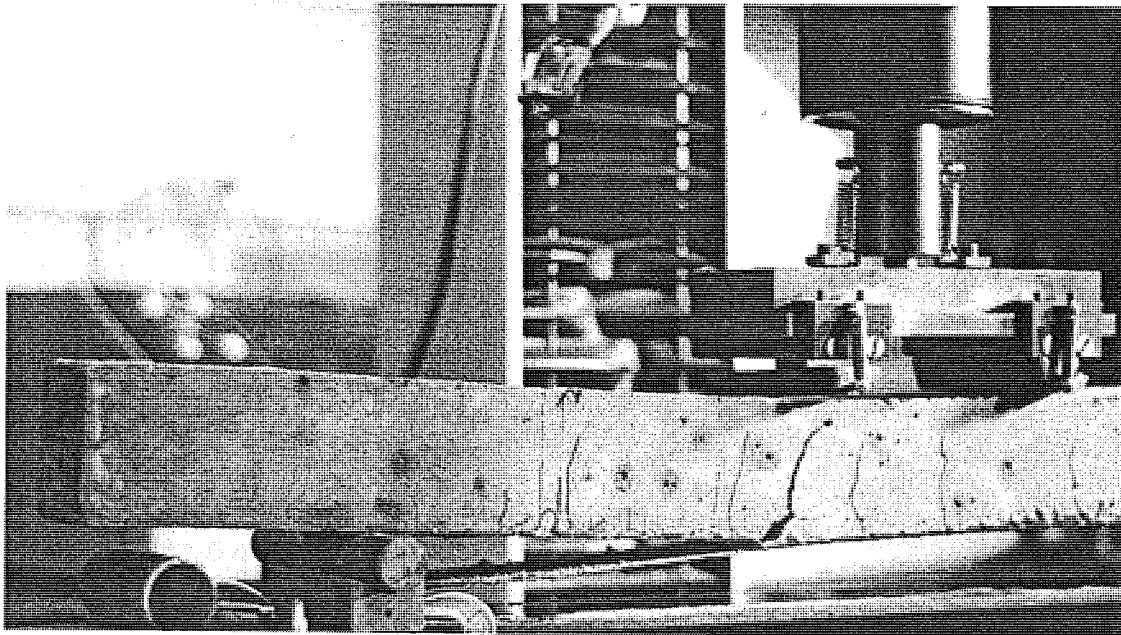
Tonen System. CFRP Peeling-Off Started at a Flexural Crack
